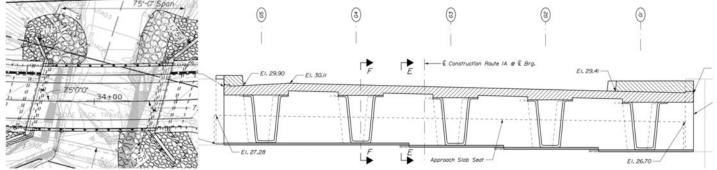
Layout and cross section of Grist Mill Bridge (Hampden, ME) (Source: MaineDOT)
